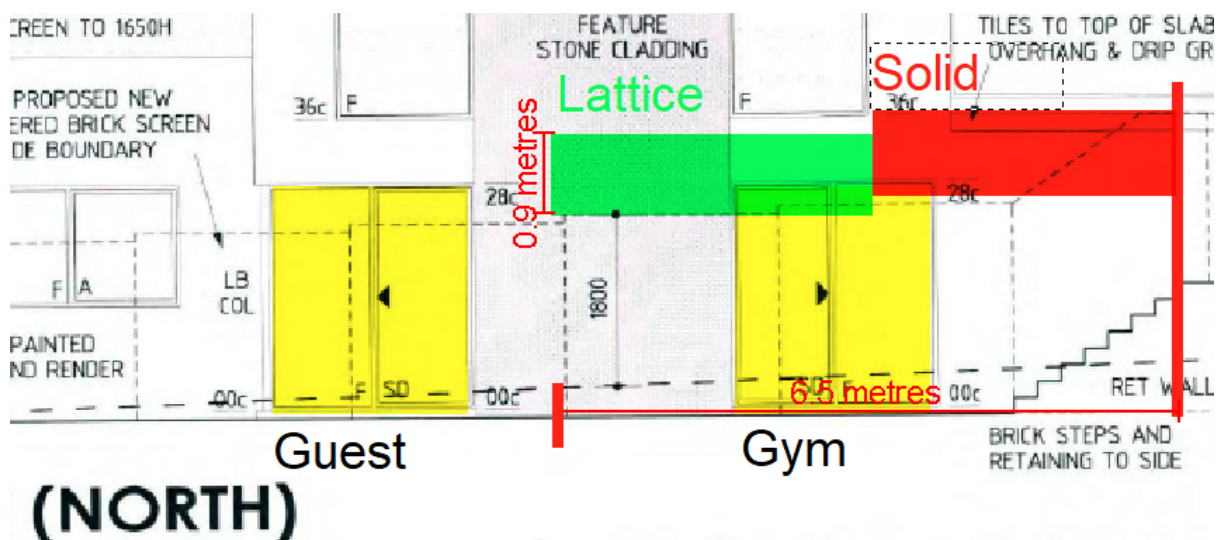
Shows the fence alteration overlaid onto the adjoining neighbours elevation. Yellow shows the ground floor Guest and Gym sliding doors (major openings) in relation to the fence alteration in green and red.
